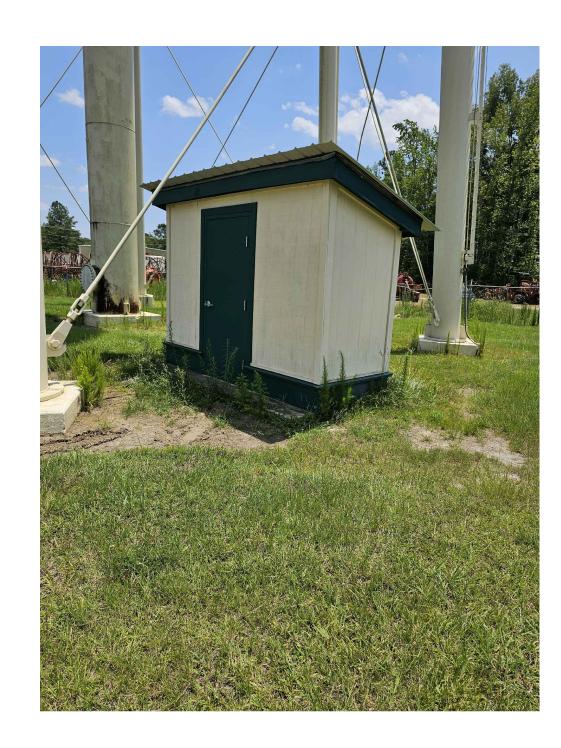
LOOKING EAST TOWARD ALTITUDE VALVE BUILDING
